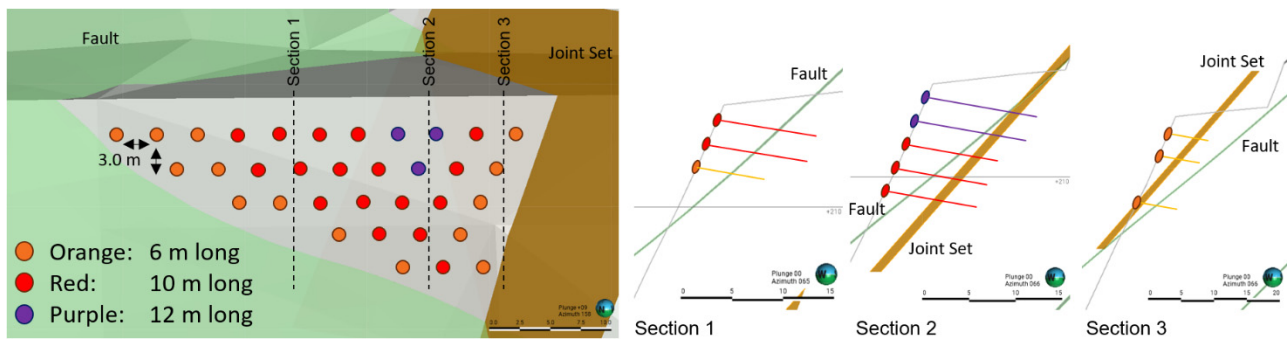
Bolting pattern design to support fault-on-wedge geometry at Location 2
